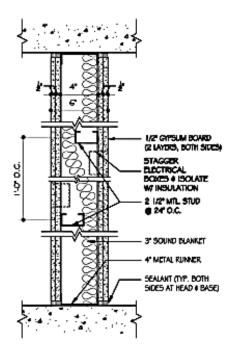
Common partition wall barrier between the private offices and conference rooms with an STC rating of 54
